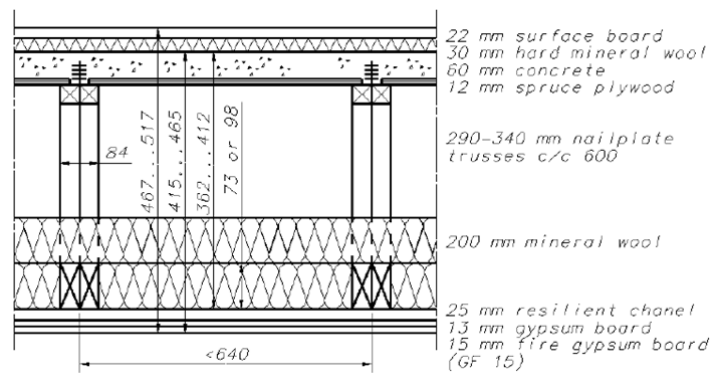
cross-section of the VTT cast-in-situ wood-concrete composite multi-storey house floor system
